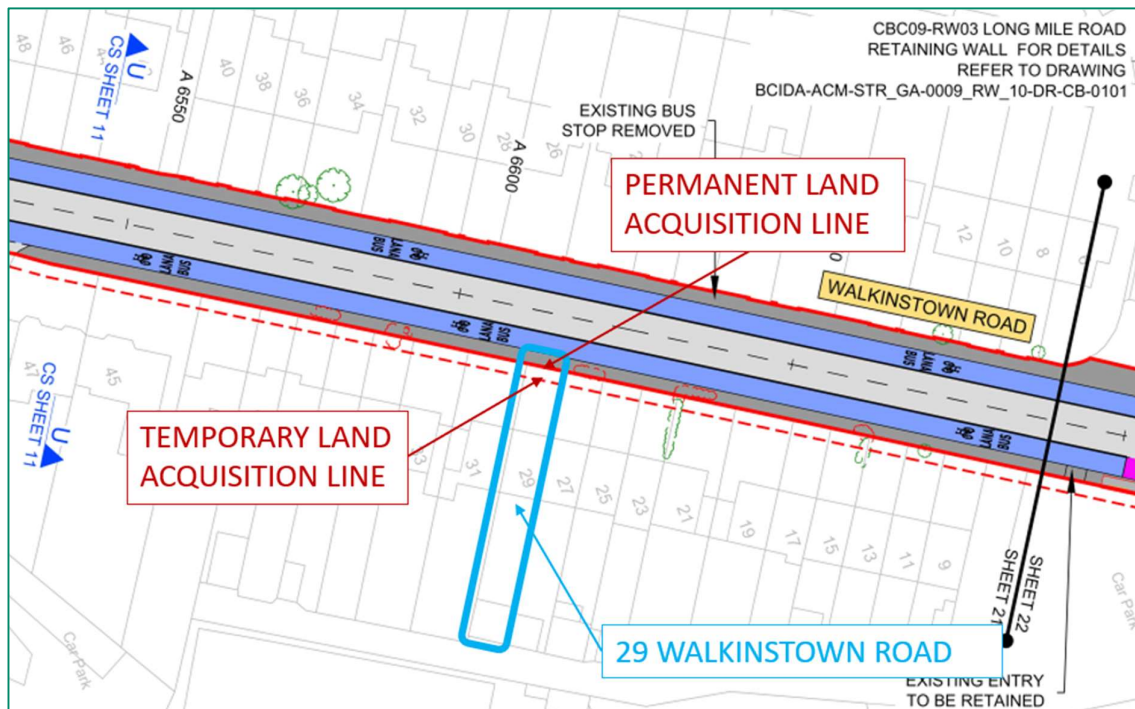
General Arrangement of Proposed Scheme adjacent to 29 Walkinstown Road (Sheet 21)
